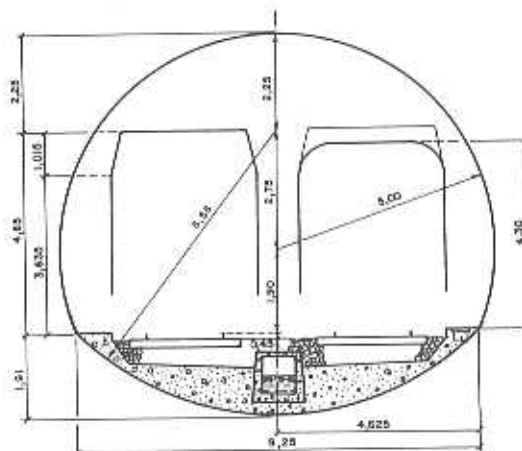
CROSS-SECTION OF THE TUNNEL
